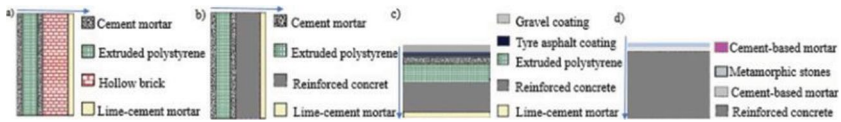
Building Envelope Layers: (a) Hollow Brick Wall, (b) Concrete Wall, (c) Roof Flooring, (d) Earth-Contact Flooring.
